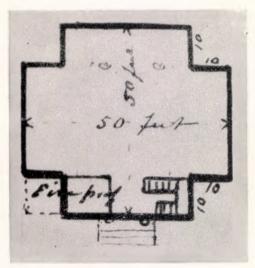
Floor plan, 1851 (enlarged). Ground floor one large room, except for the fire proof and closet. Philadelphia Contributionship.
